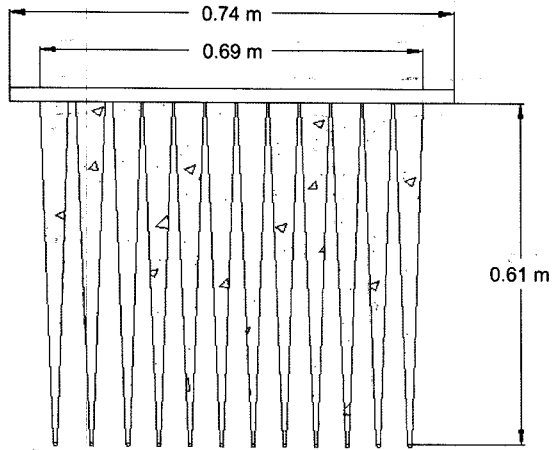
An end view of a module(12 wedge shaped panels) connected to the top support.
